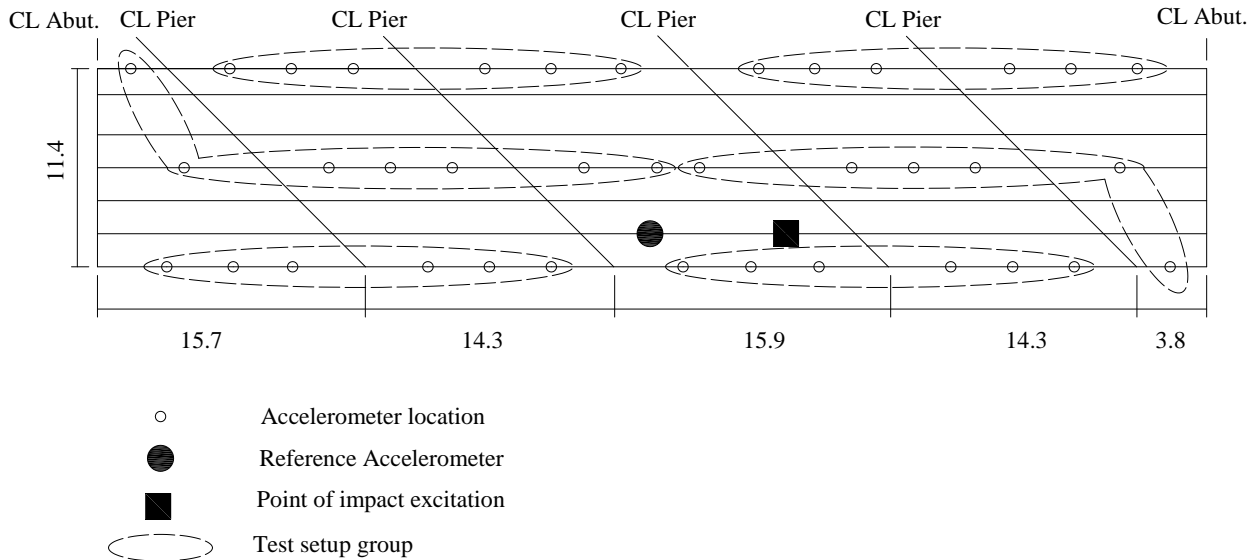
Schematic plan view showing test setup for Broadview bridge.
